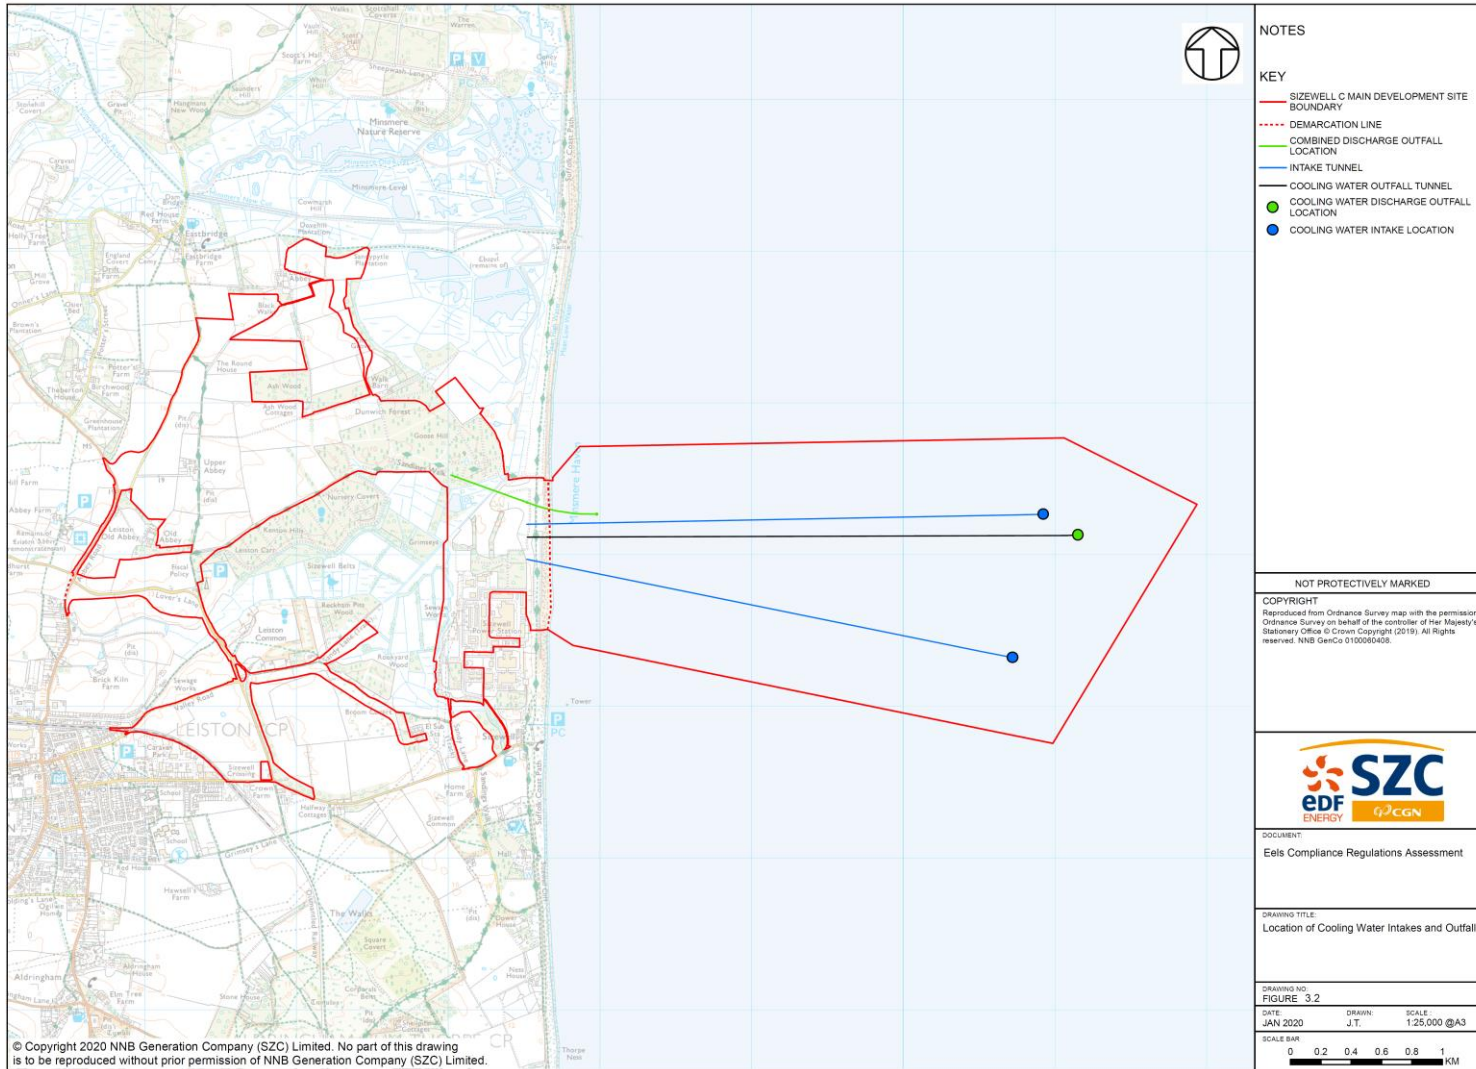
Location of Sizewell C Cooling Water Intake and Outfall Tunnels
